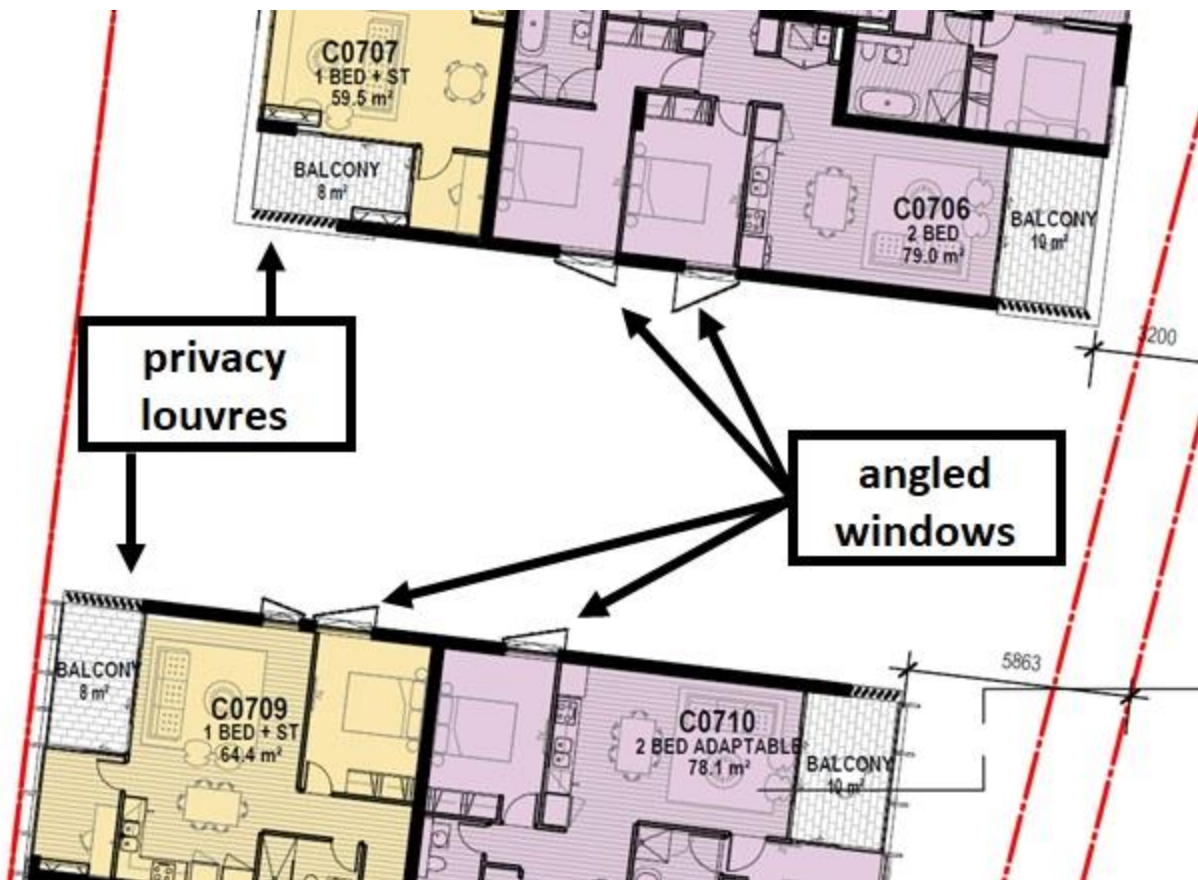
Extract of Building C Level 7 floor plan, illustrating various privacy treatments incorporated into the design
